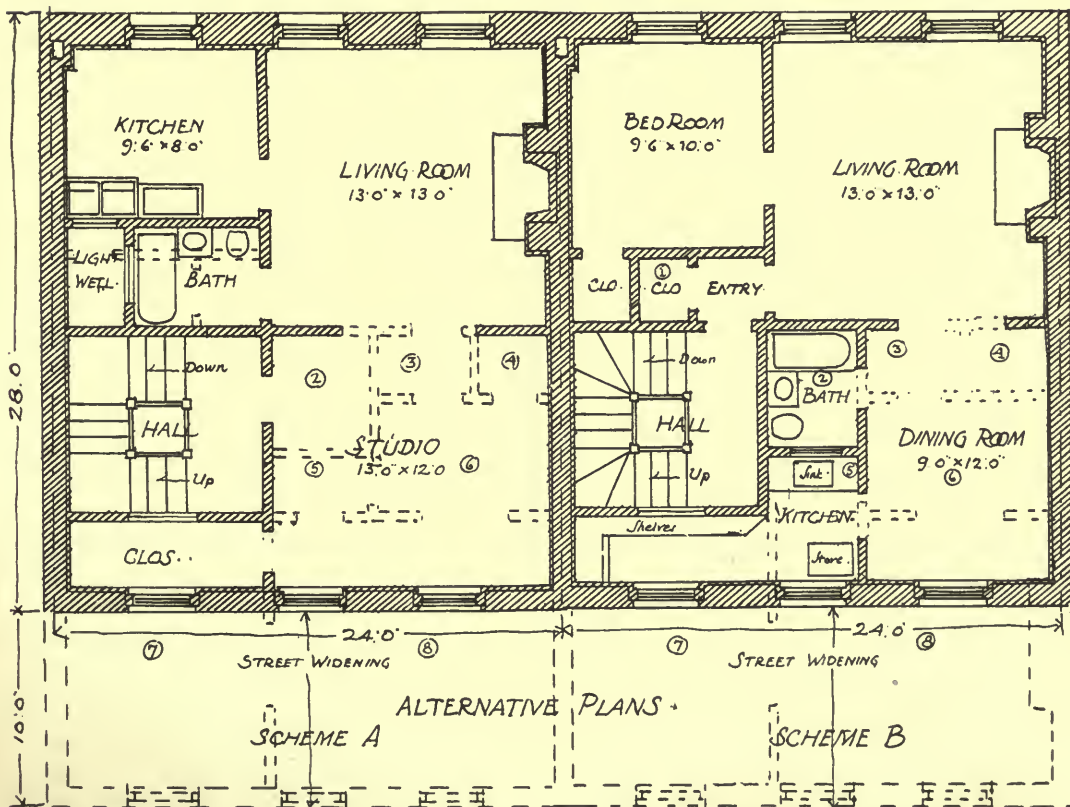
TWO ALTERNATIVE SCHEMES FOR DIVIDING AN OLD DWELLING INTO STUDIO APARTMENTS, BEACON HILL, BOSTON.
